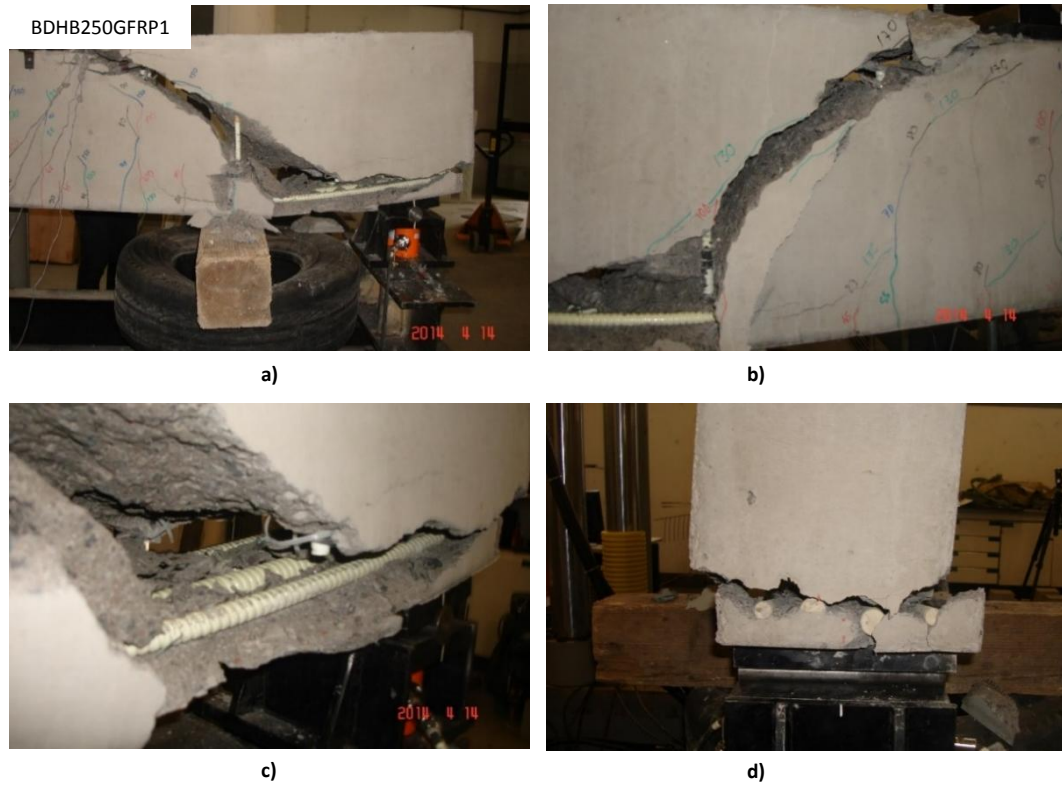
BDHB250GFRP1 beam failure: a) overall view near the support; b) fractured top and bottom heads; c) bottom reinforcement pull-out; d) detachment of the section near the bottom reinforcement
